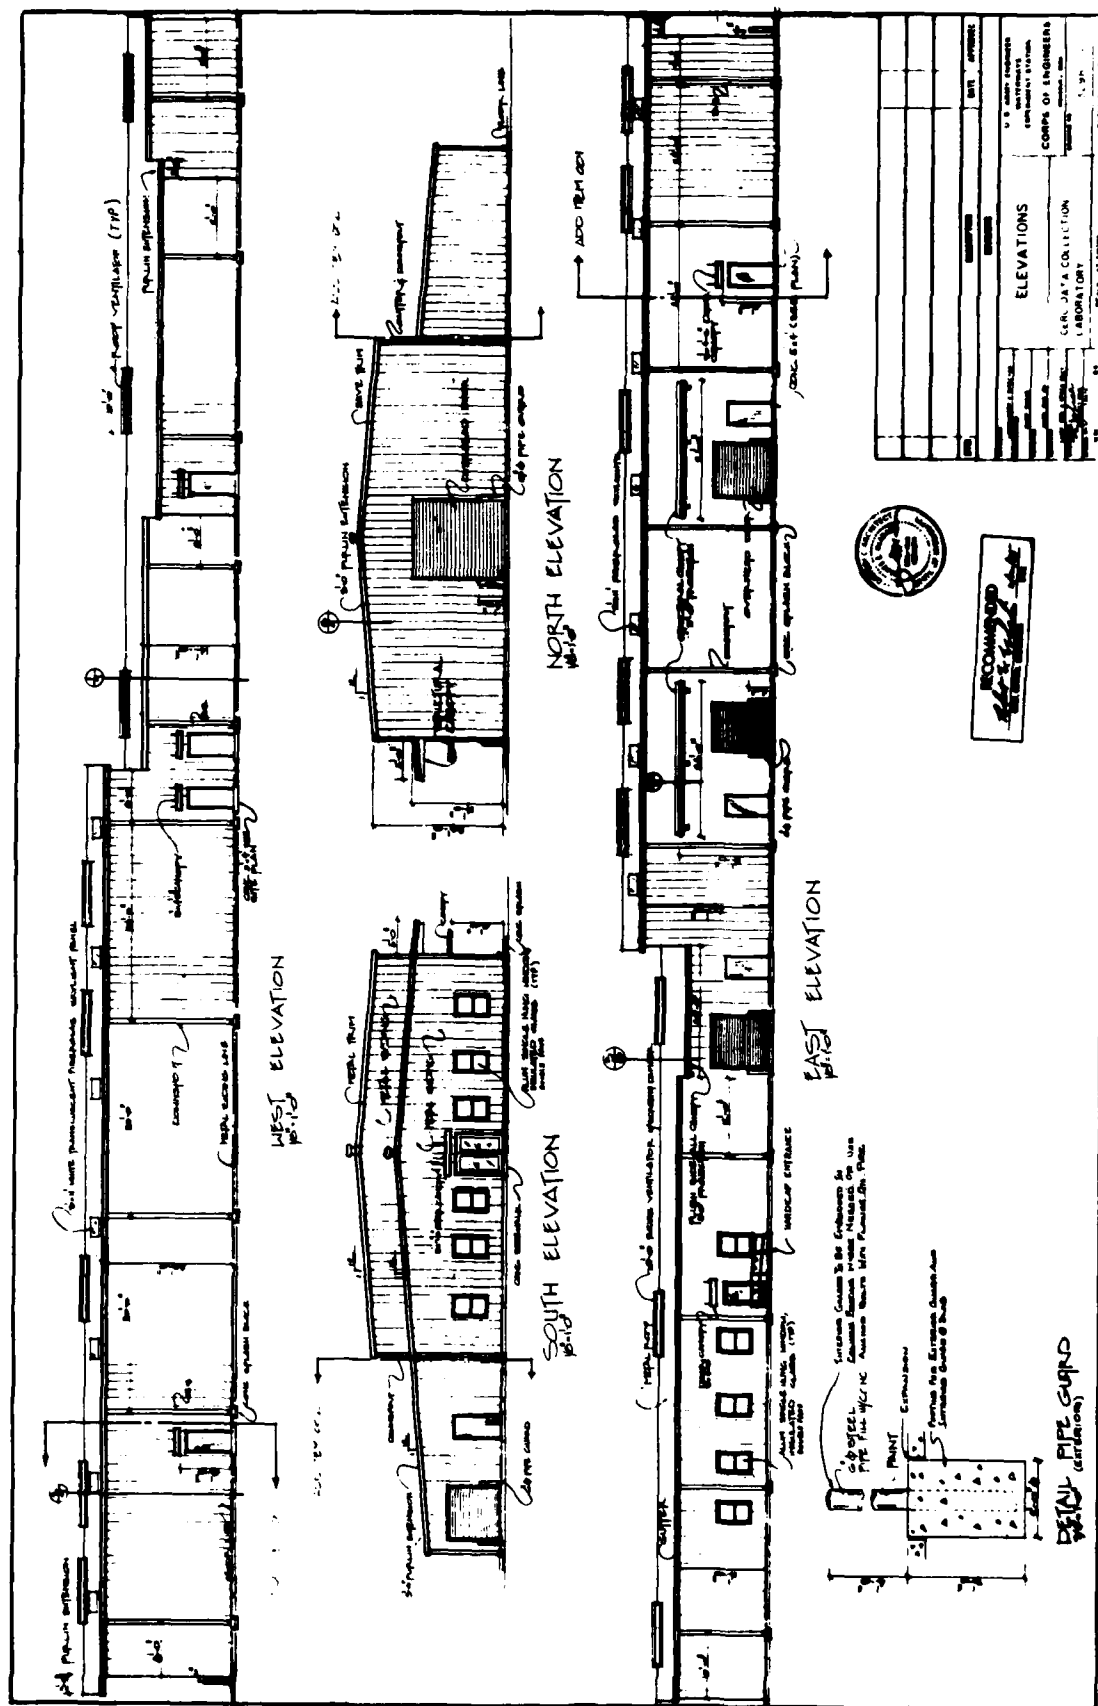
WEST, SOUTH, NORTH, AND EAST ELEVATIONS OF PHASE III
